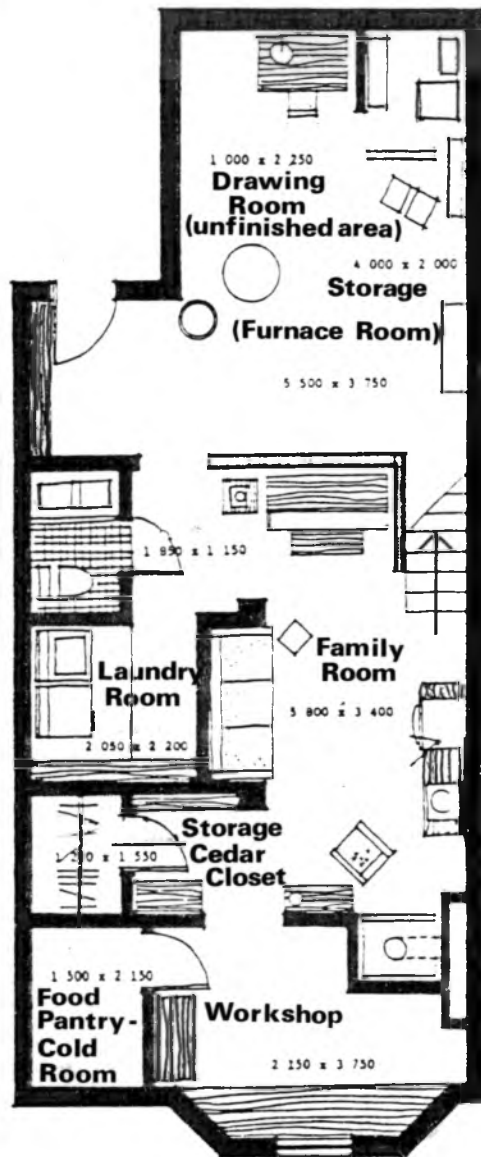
Basement plan of the split-level house occupied by Household 10. In this house, grouping together the bathroom, laundry room, stairs, cold room, sauna and furnace room, made it easier to install the family room and bedroom 3 (1070). Scale: 1/100.
